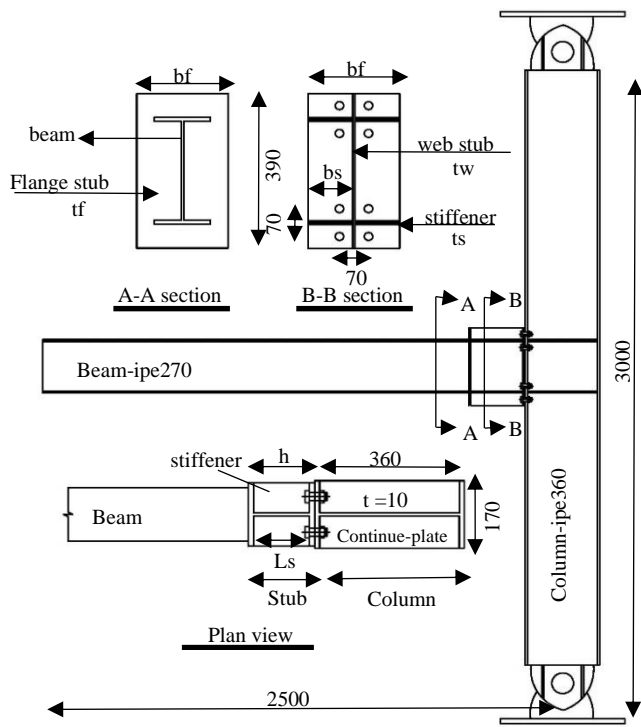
Typical details of proposed connection model(I): (unit: mm)
